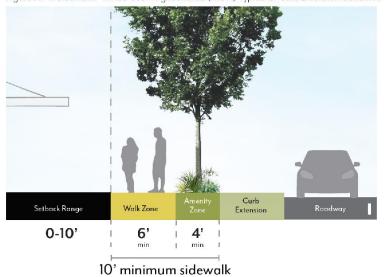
Sidewalks - Mixed Use Neighborhood (MUN)
